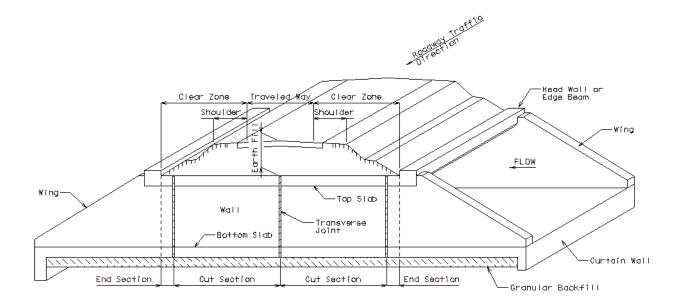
Three dimensional view of typical box culvert
